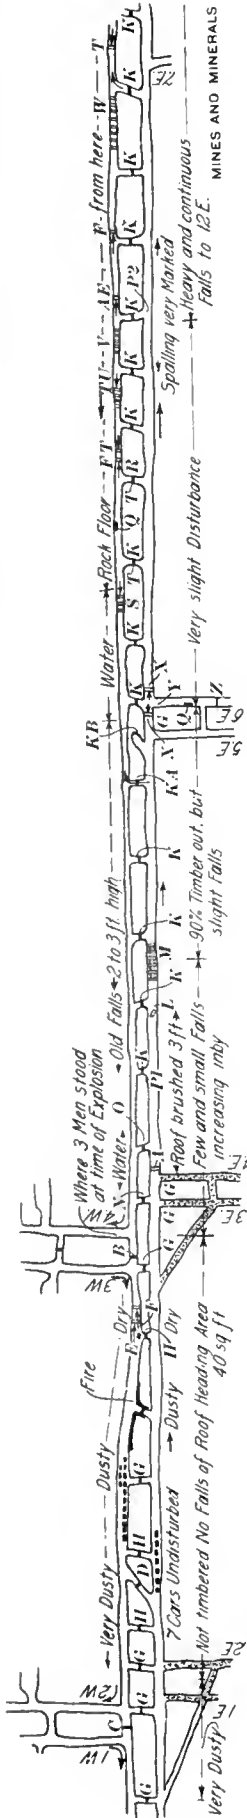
ENLARGED SECTION OF ENTRIES AT FIRE AND COKING ZONE
